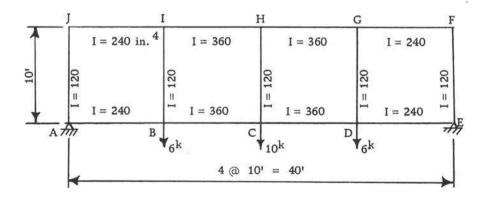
Symmetrically Loaded Vierendeel Truss
